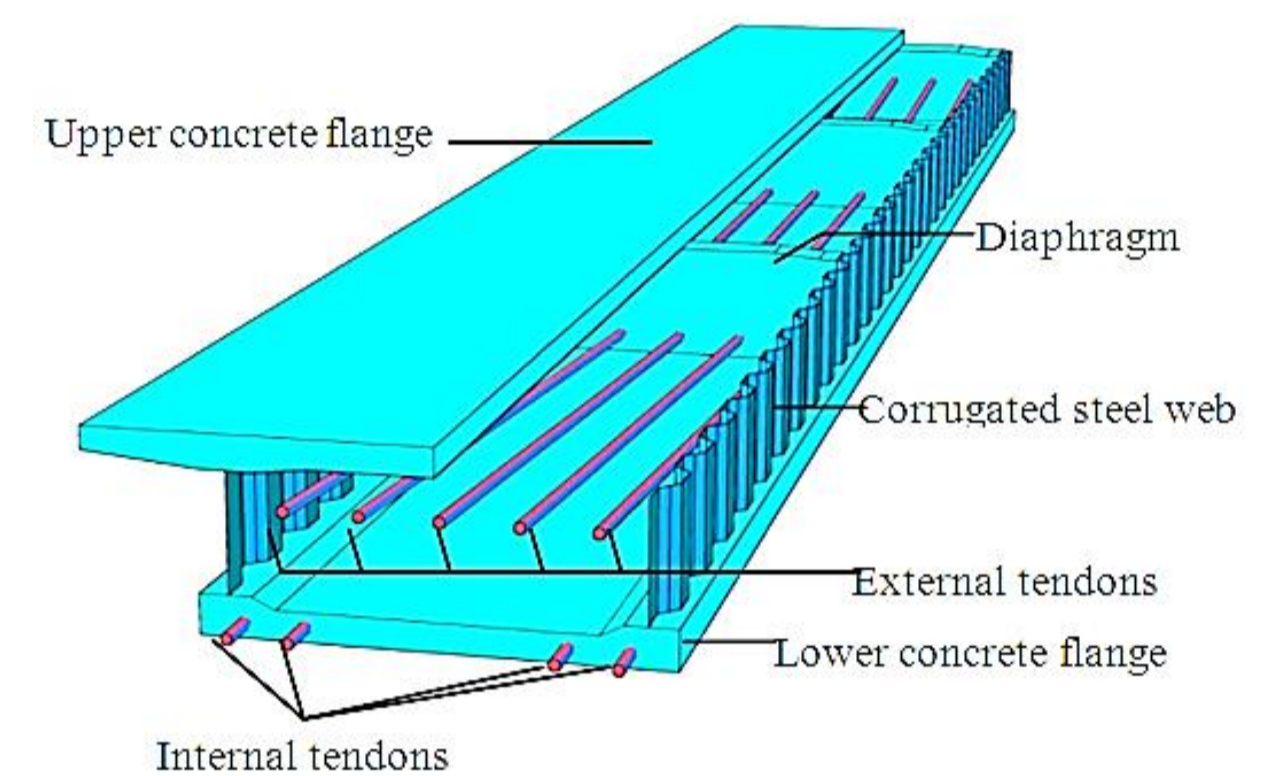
Schematic representation of a corrugated steel web prestressed concrete box girder [1]
